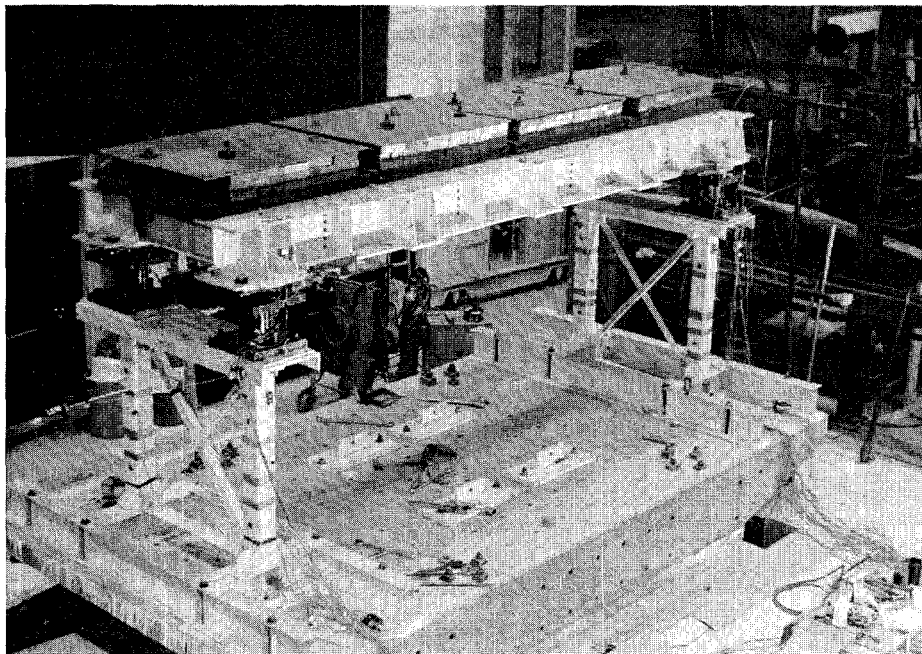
View of Bridge Model in Configuration with Two Flexible Piers.
